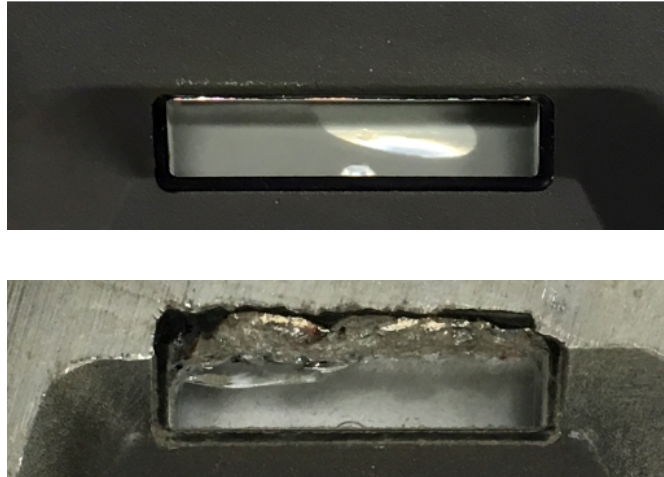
In-pavement navigation light prisms – new (top) and damaged (bottom) [28]
